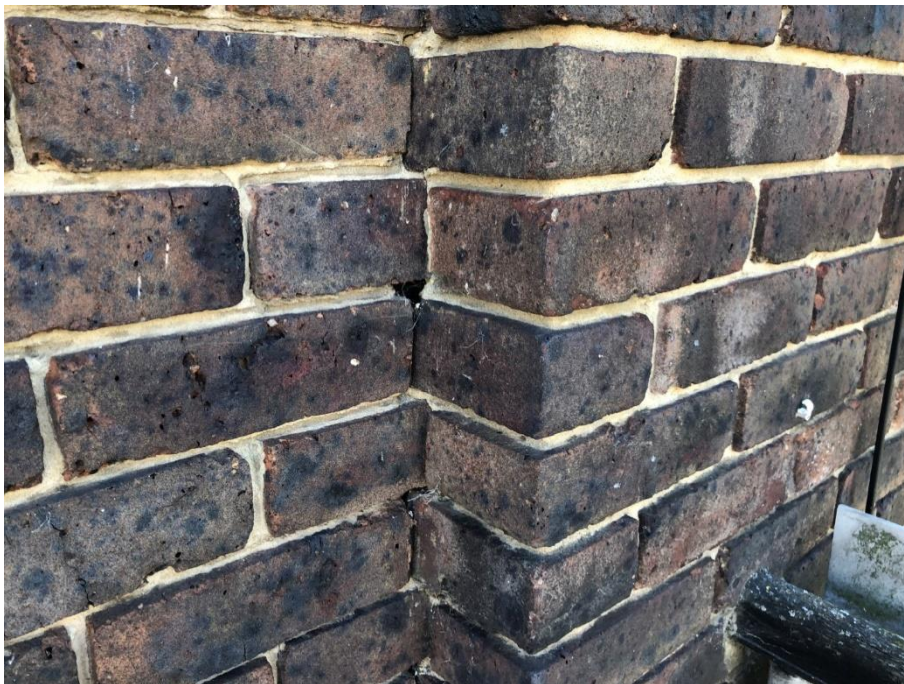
Heversham House – Vertical cracking through brickwork nibs.
